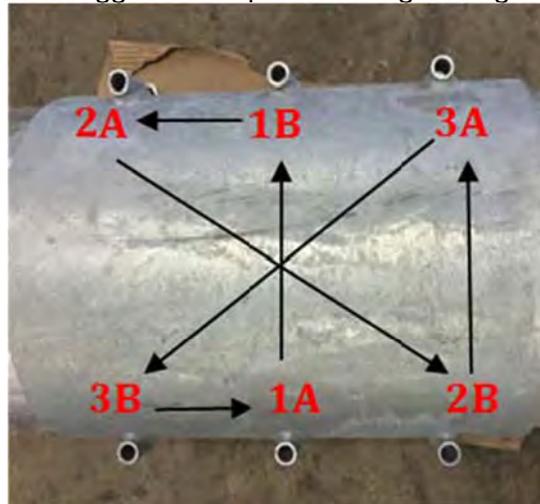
Top View of Cradle excluding bolt assemblies. Recommended alternating tightening sequence.
